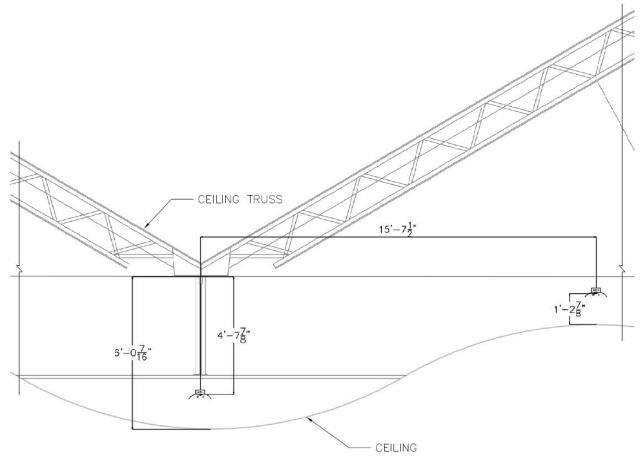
Auditorium Ceiling Luminaire Mounting Detail
